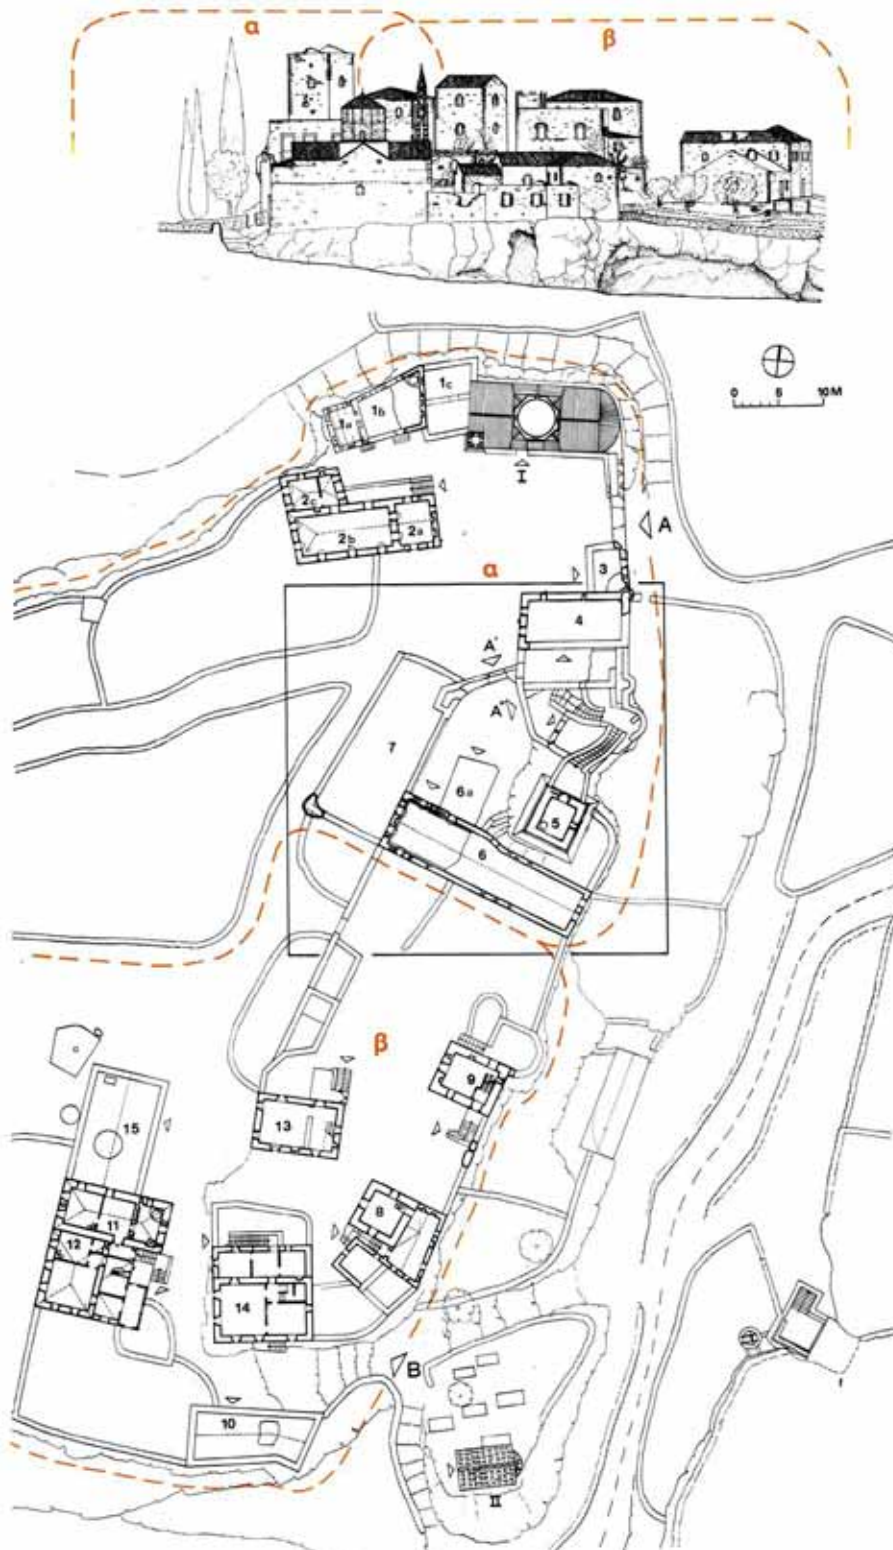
The Mourtzinos and Petreas complexes. Above, north façade; below, first floor plan.. (Saitas, 2001)
